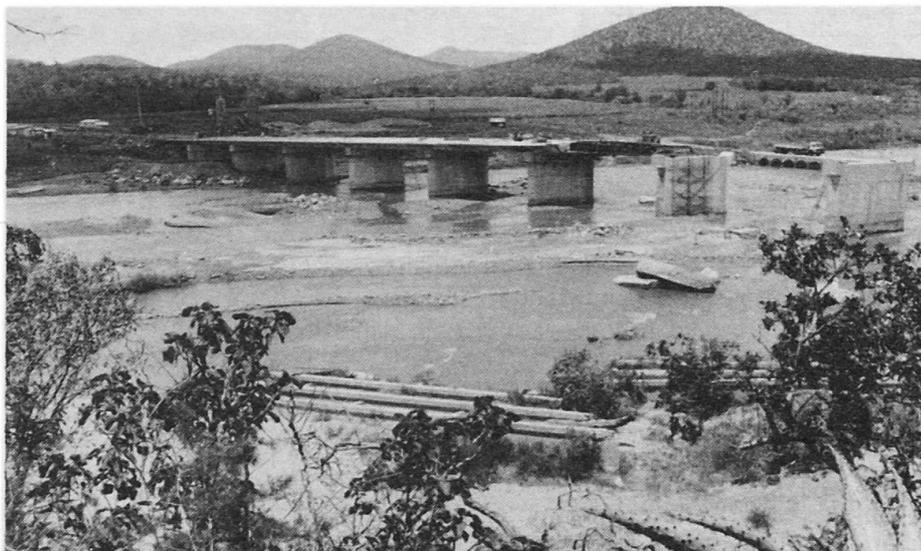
Bridge during construction, with remains of earlier structure in the foreground.
